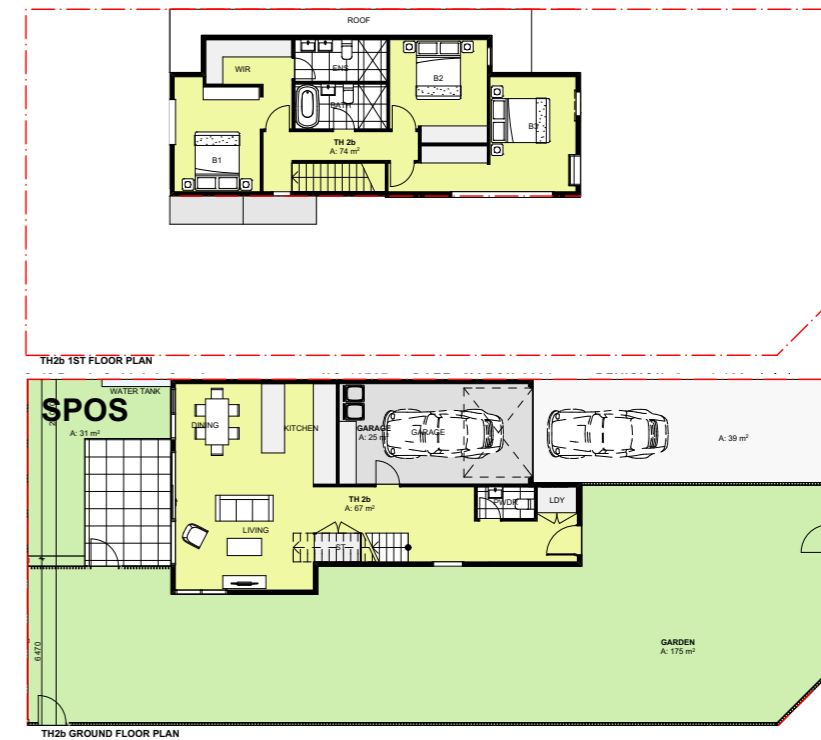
Townhouse Type 2b (Source: Plus Architecture)
